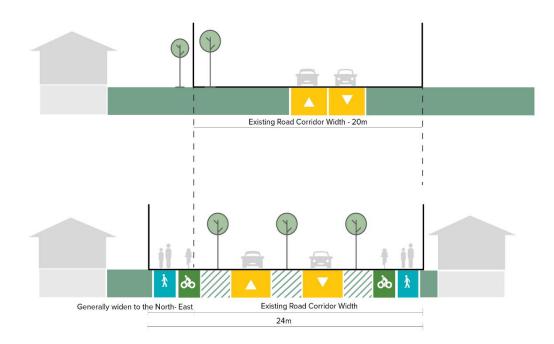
Ōpāheke Road (Rural) corridor typical cross section
